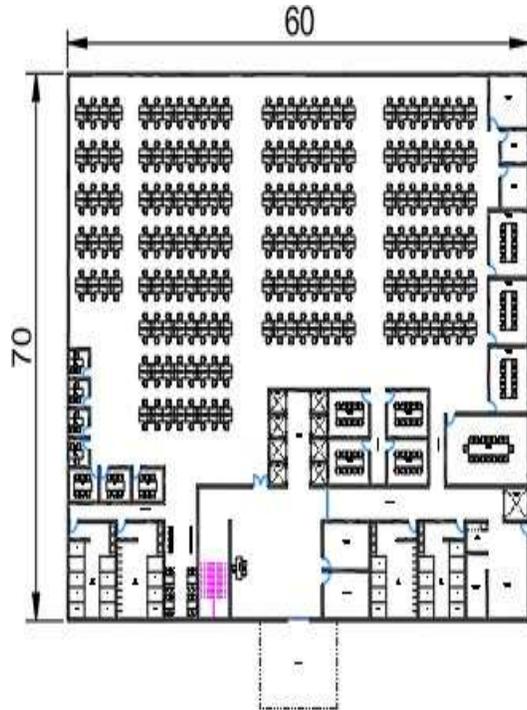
Plan of (G+12) commercial Building, size of building is 60mmX70mm
